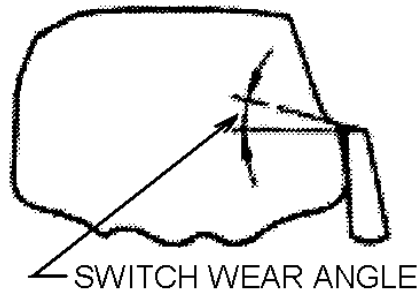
Stock rail side wear and switch blade width/height detail:
